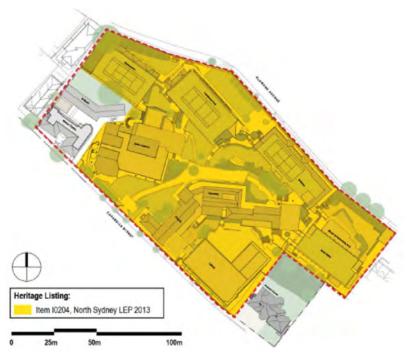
LEP heritage listing overlaid on the Loreto site plan
